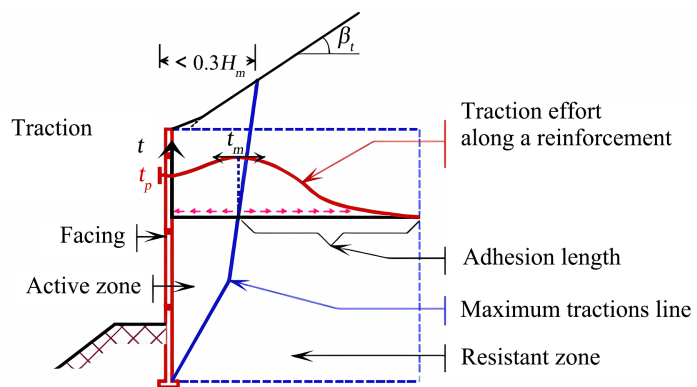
Distribution of tension in the reinforcement of a reinforced earth wall [27].
